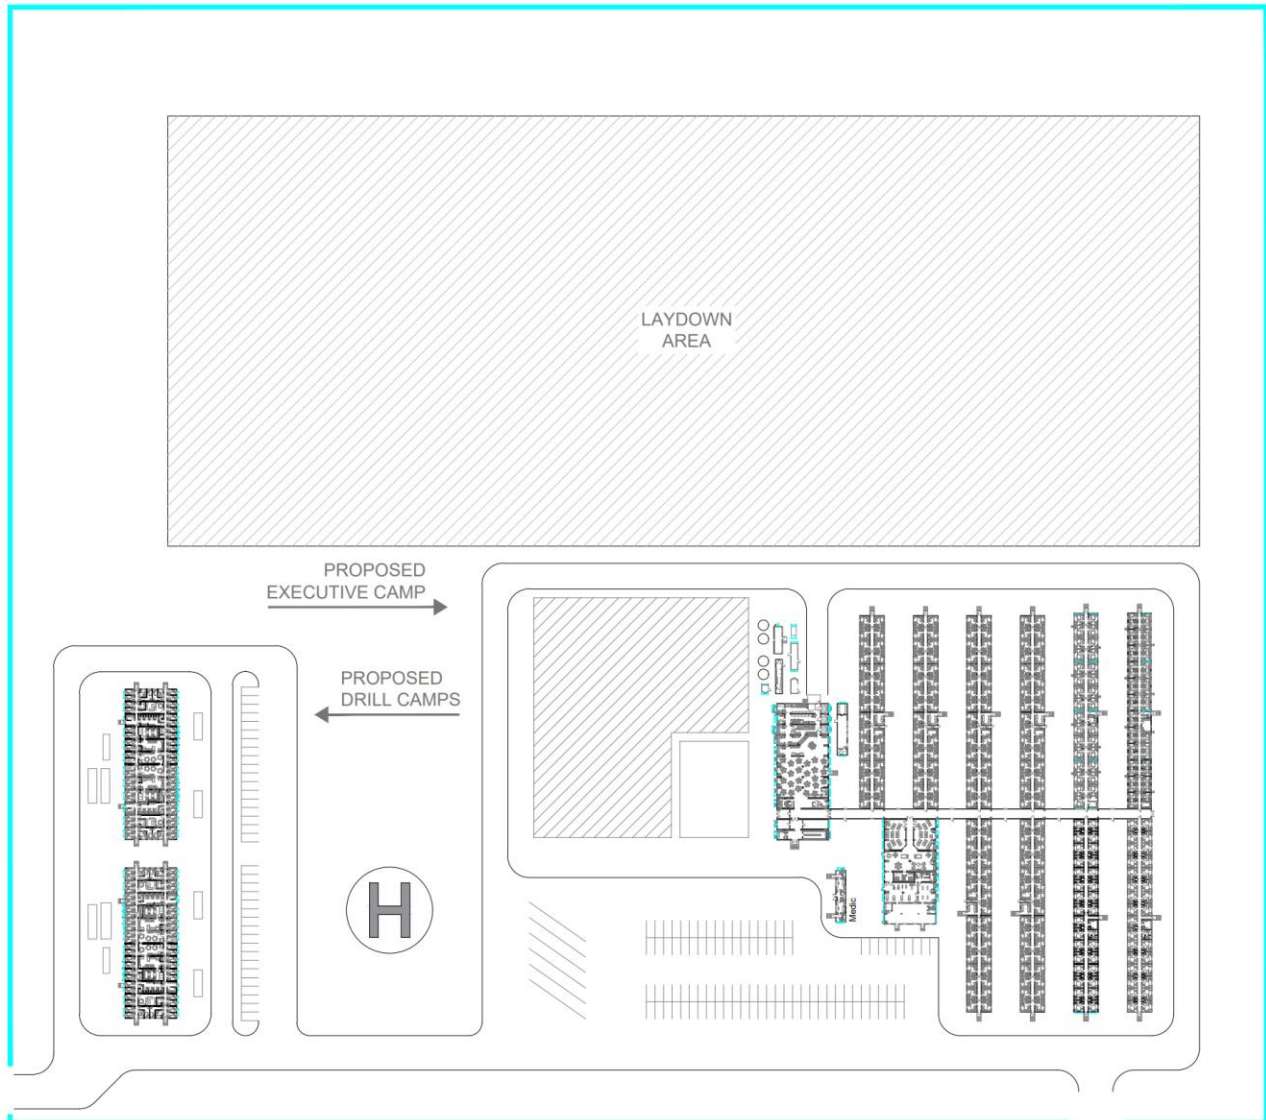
Proposed Camp Site Plan (Source: Clean Harbours Lodging Services)
